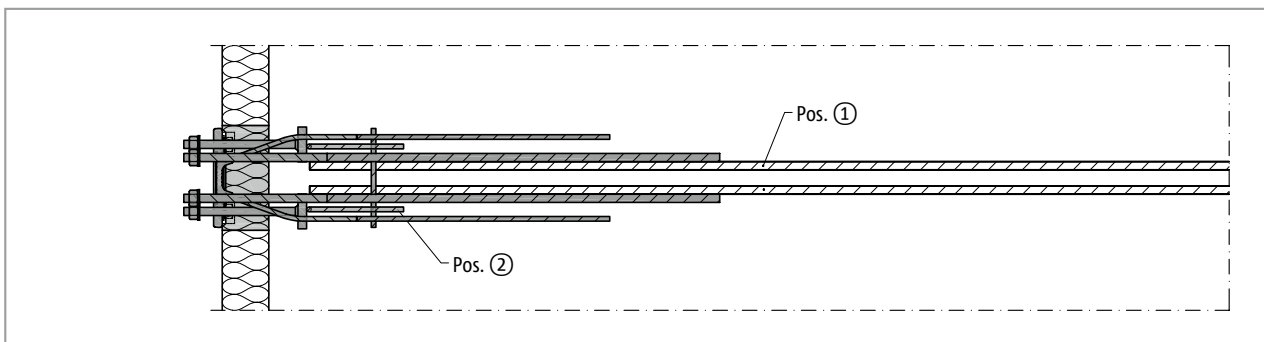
Schöck Isokorb® T type SK-M1: On-site reinforcement: Plan view
